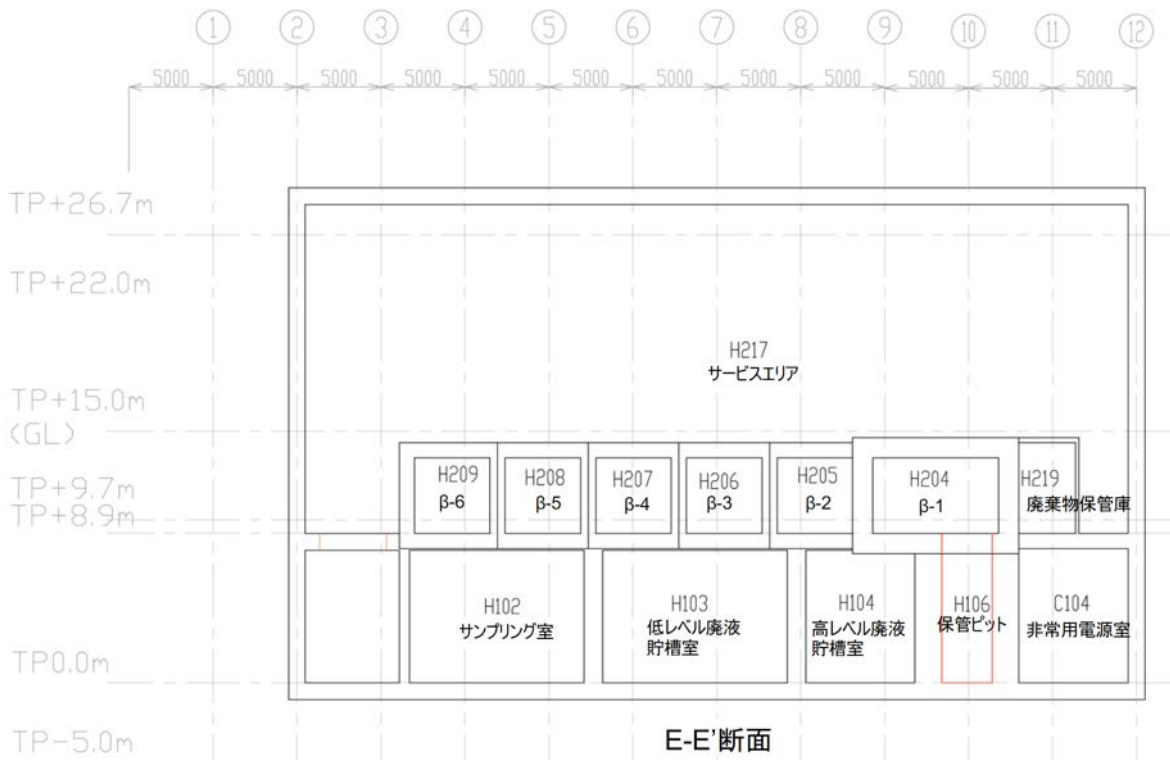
Elevation view of PIE facility (E-E').
